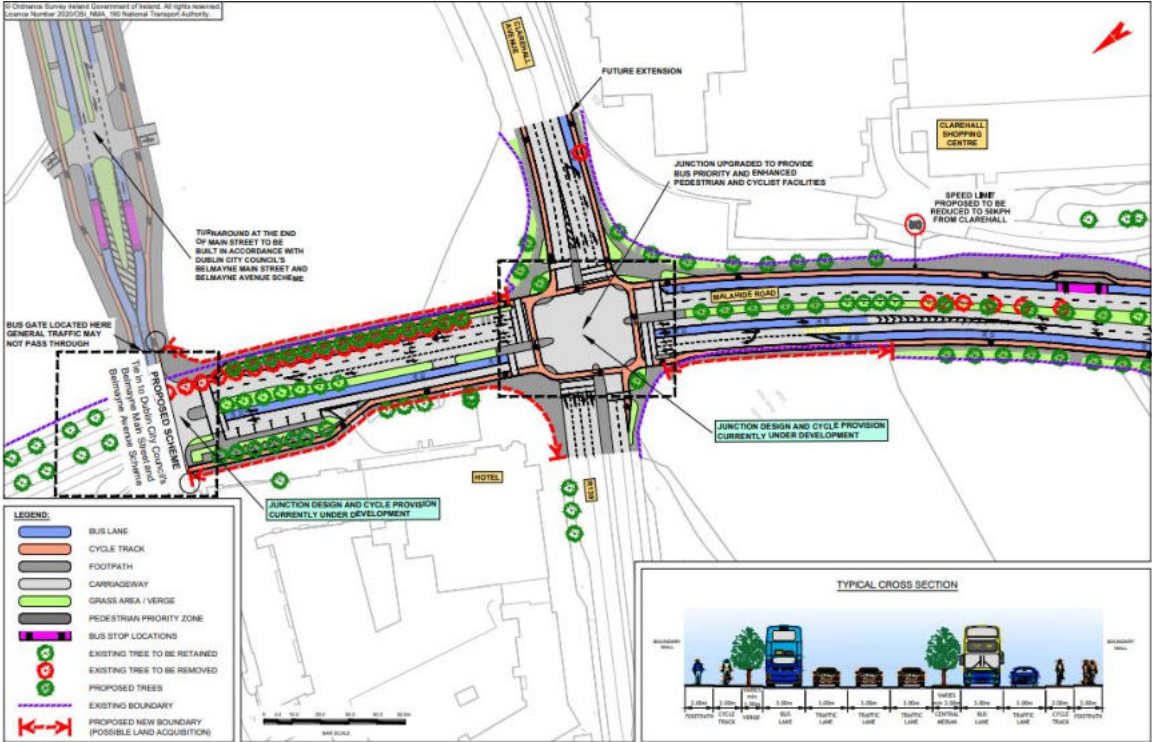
| BusConnects – Proposed Clarehall Junction Layout
